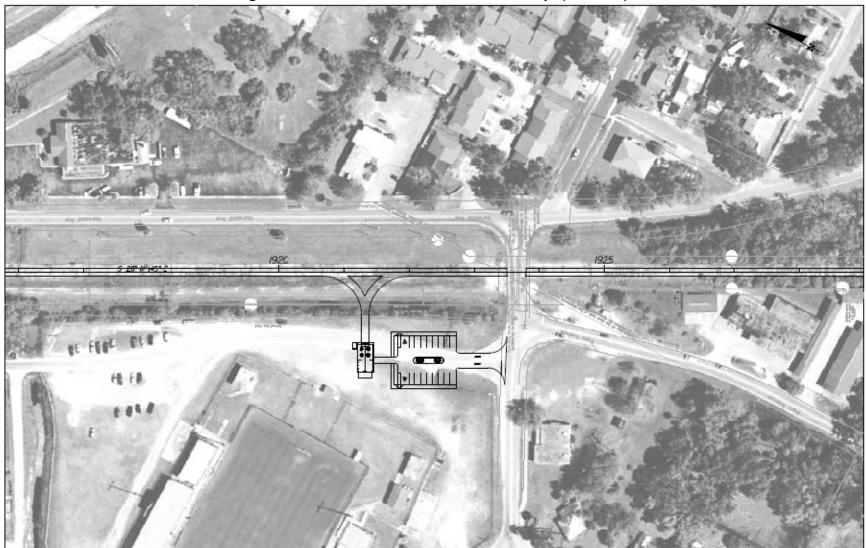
Draa Road Park Trailhead Concept (Sta 1921)
